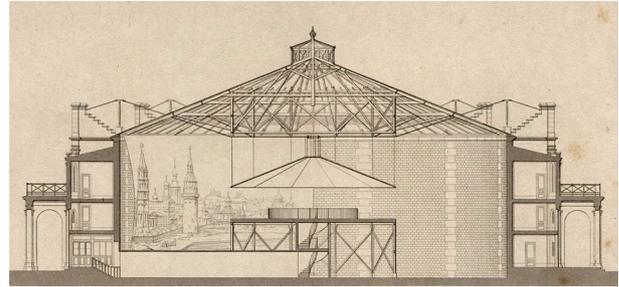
Section of the Champs Elysées 'Panorama' [Hittorff 1842, Planche 2]
